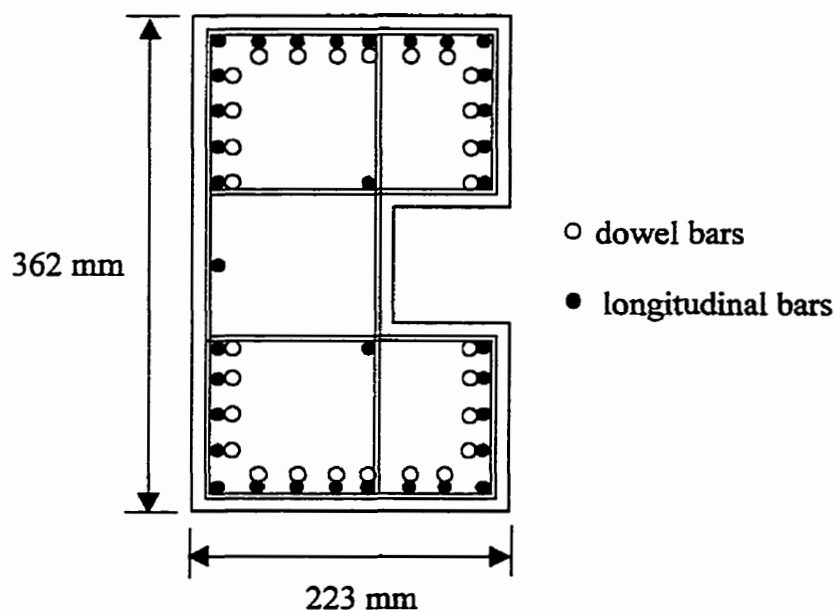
Cross Section and Dimensioning of the Bridge Pier Specimen
